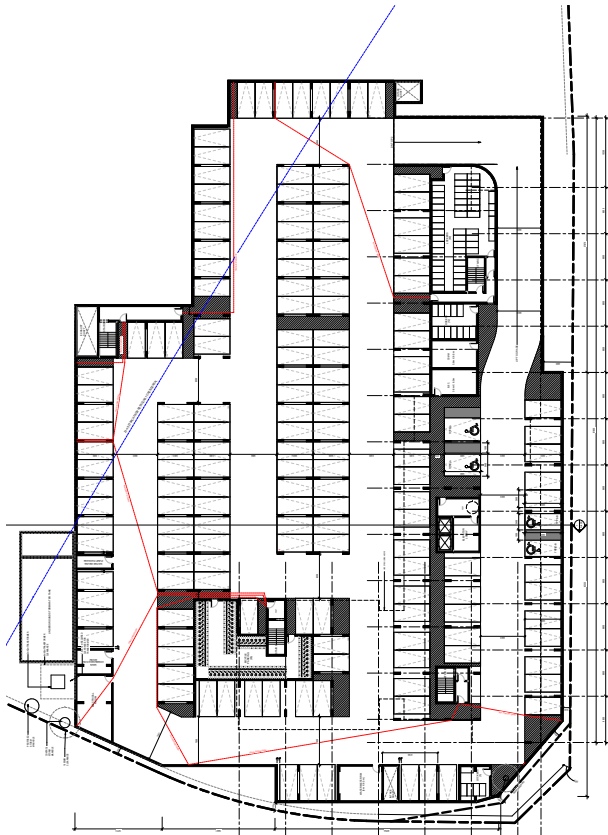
P1 Floor Plan of the Proposed Underground Parking
